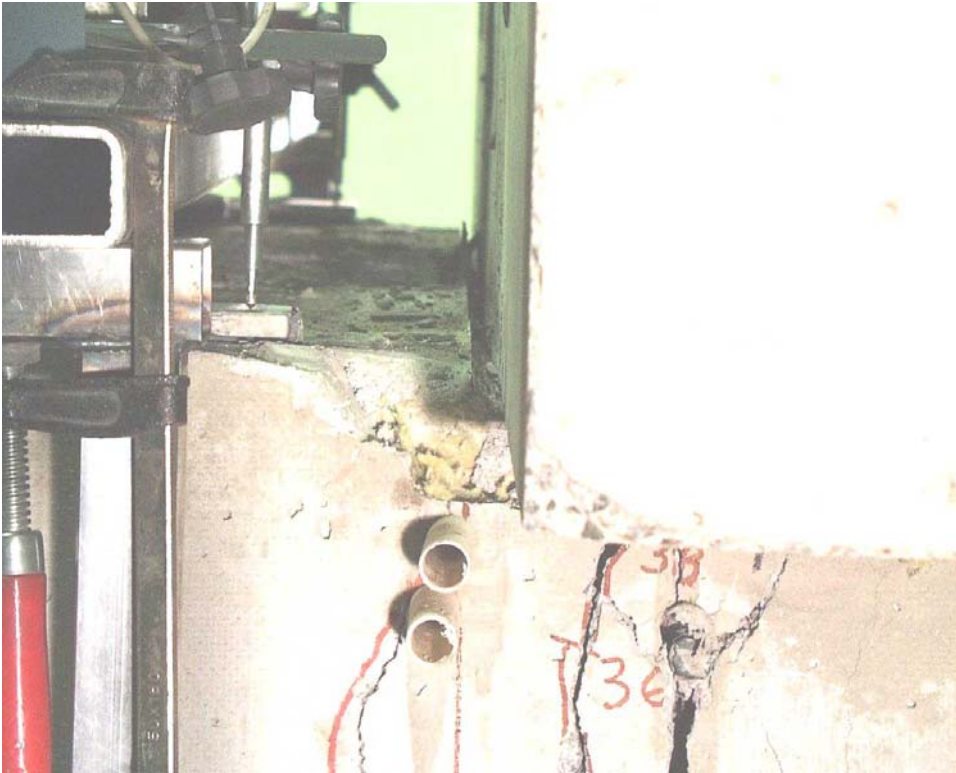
Cracking in upper wall element after failure seen from north.
